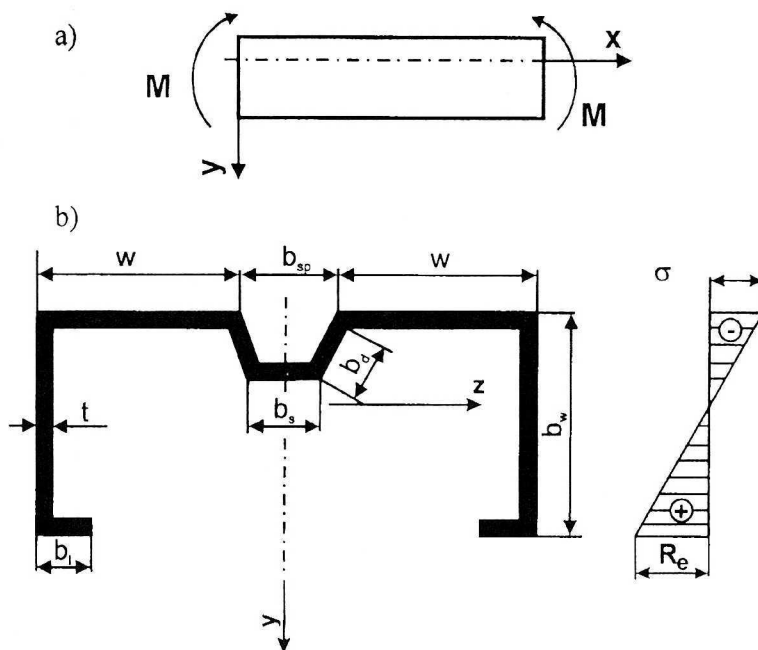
Thin-walled beam under pure bending and cross-section of the beams with a central intermediate stiffener
